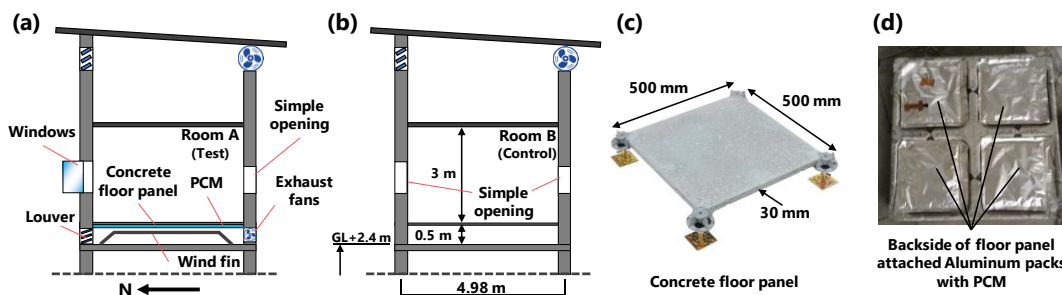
Description of experimental building: (a) Section of Room A, (b) Section of Room B, (c) Detail of concrete floor panel, and (d) Photo of PCM.
